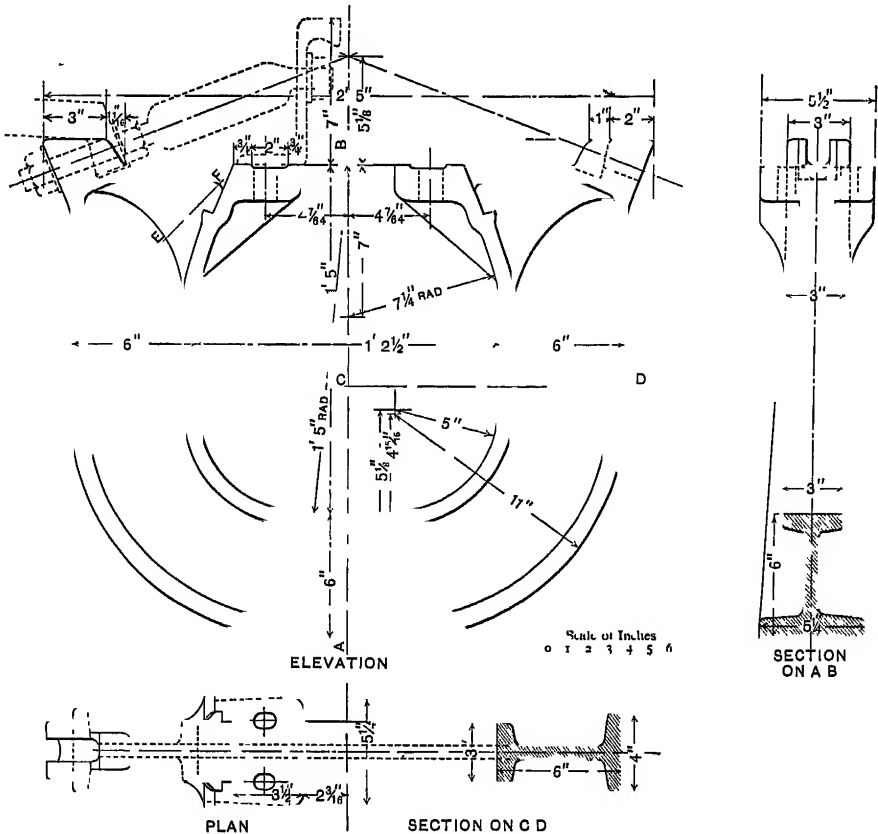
Washington Tramways (Metropolitan Railroad Co)
